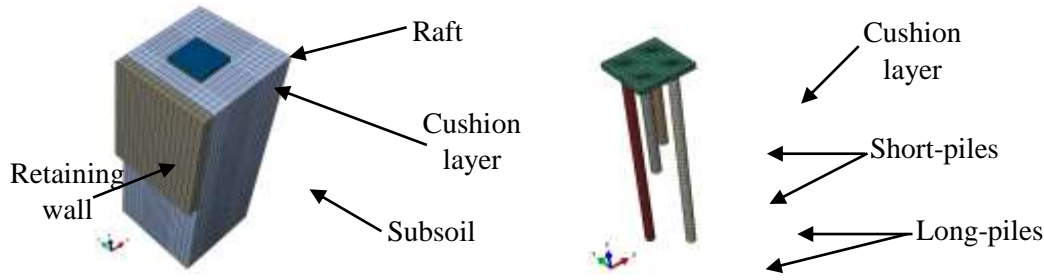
The 3D and internal view of FE mesh of the composite foundation and retaining wall
